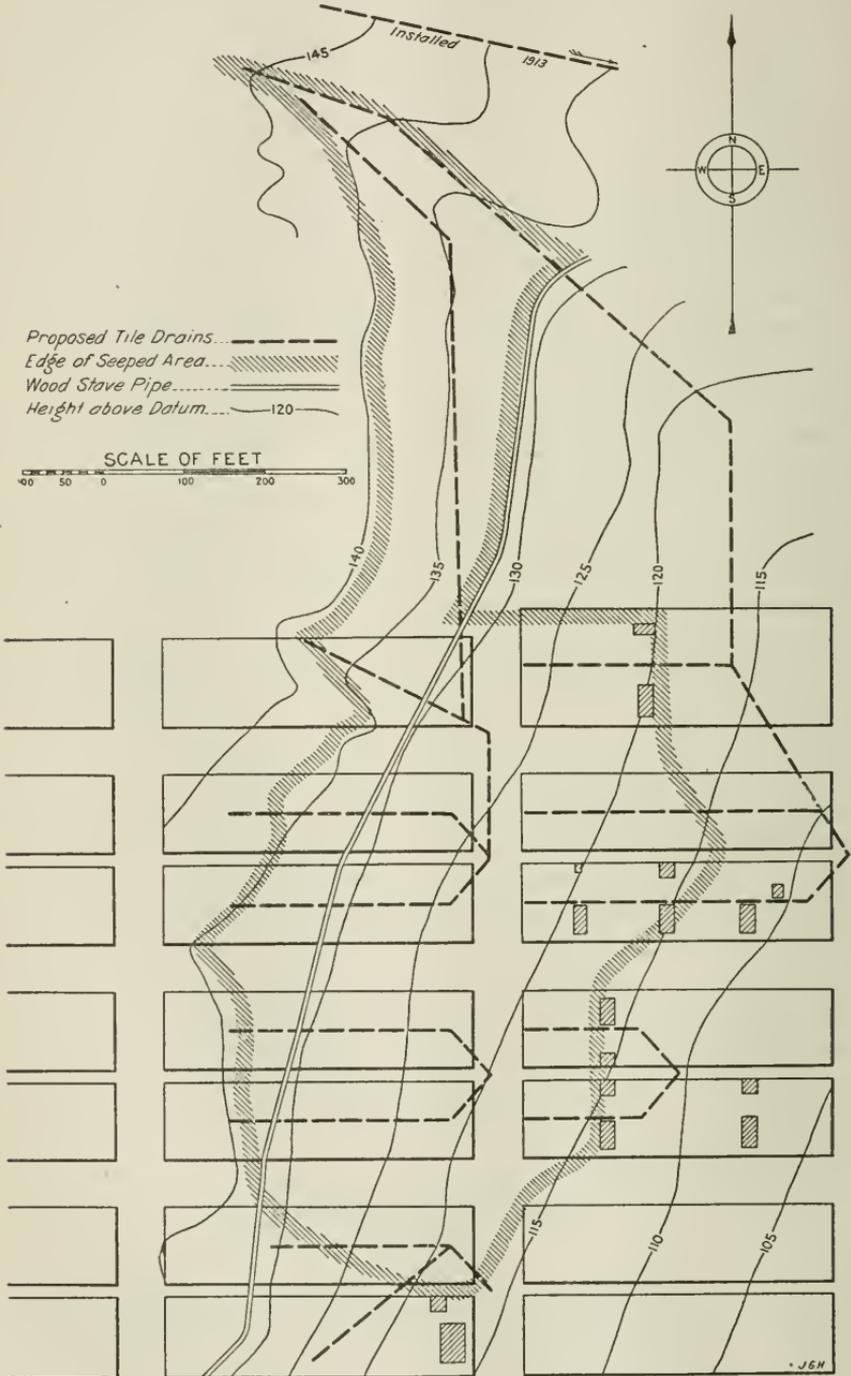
Tract near Canon City, Colo., showing proposed plan of drainage.
